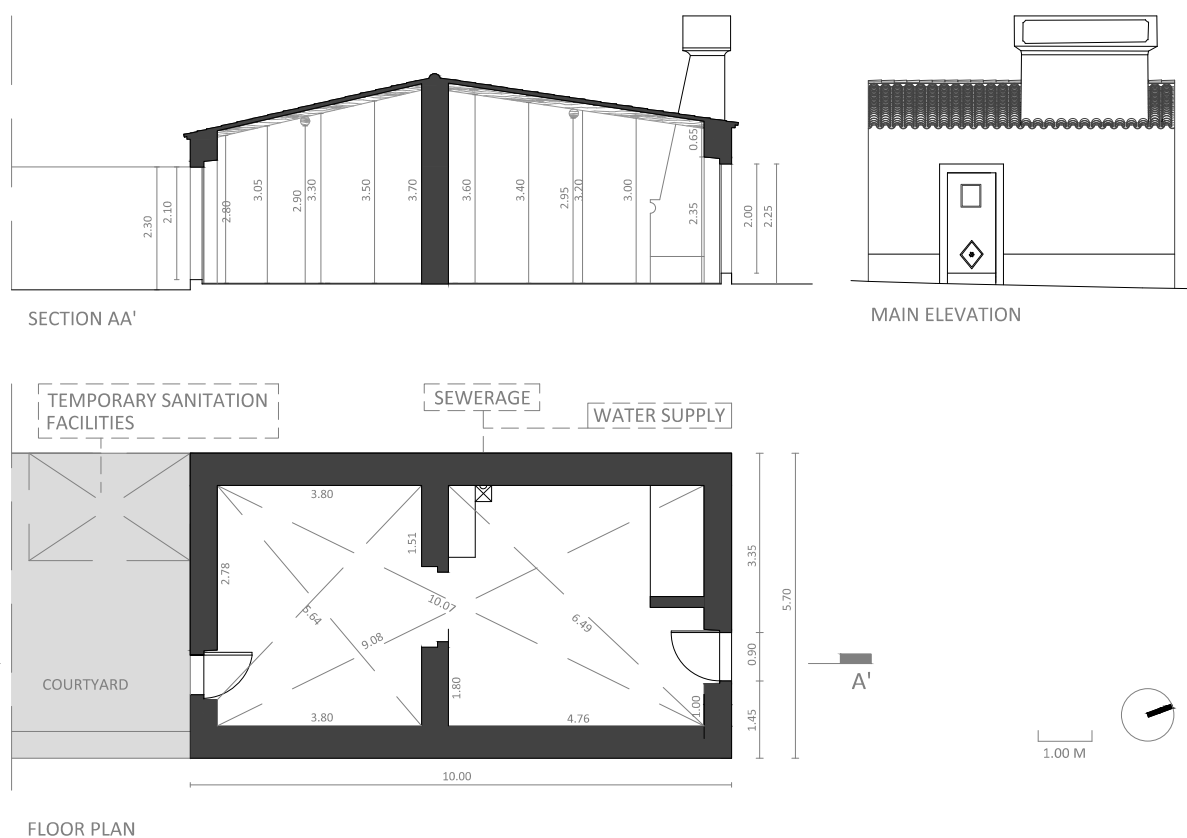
Typical case study layout: Floor plan, section, and elevation. Views: 1 - Limestone and earth masonry, lime wash; 2 – Roof with Arabic tiles; 3 - Chimney-Fireplace.
